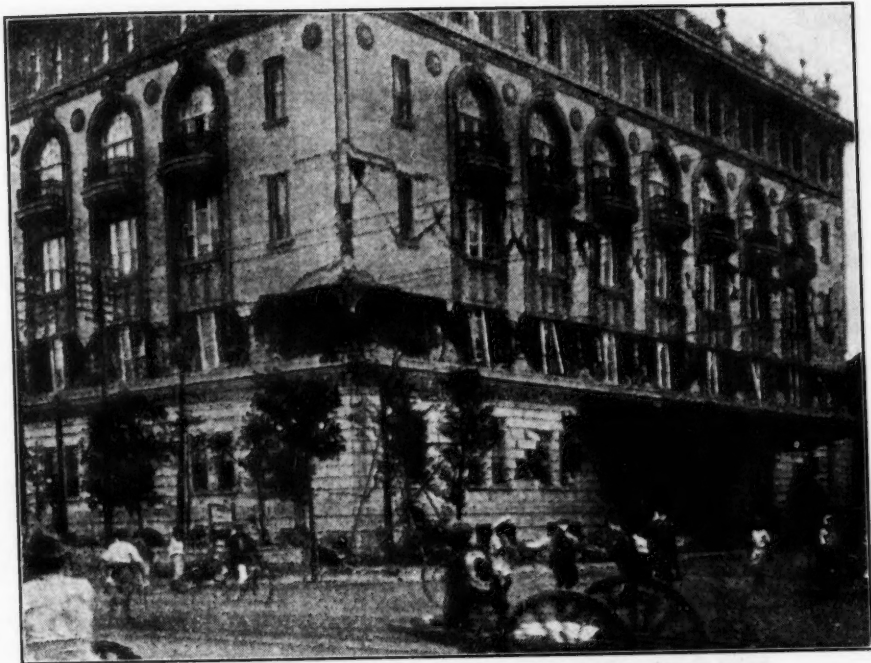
VIEW SHOWING DAMAGE TO THE TOKYO KAIKAN
